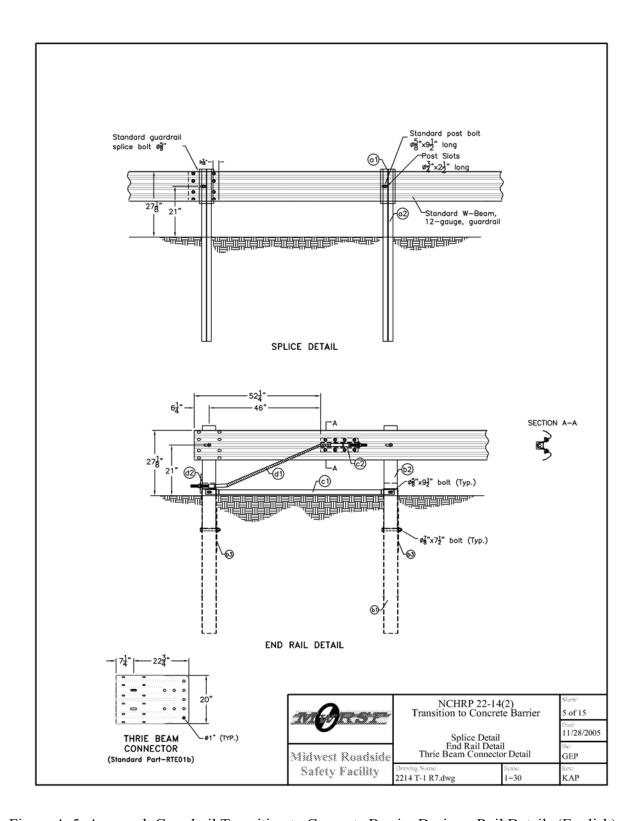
Approach Guardrail Transition to Concrete Barrier Design - Rail Details (English)
